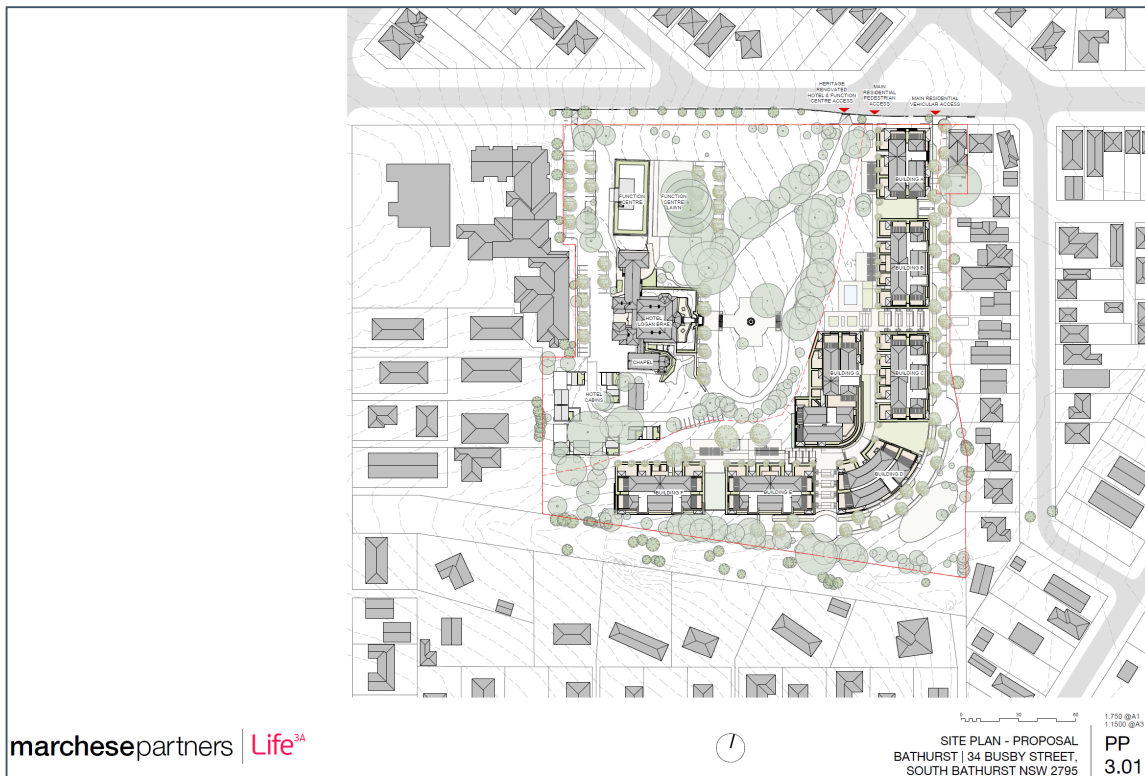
Proposed site plan (Source: Marchese Partners | Life^{3A})
